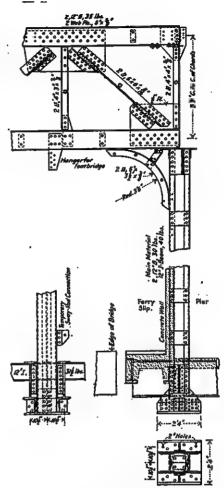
Part Transverse Section of One of the Ferry Slips, Showing Steel Framing.
